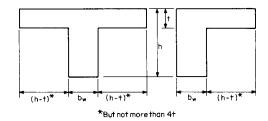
Beam sections for calculation of I_h and α_1 .
